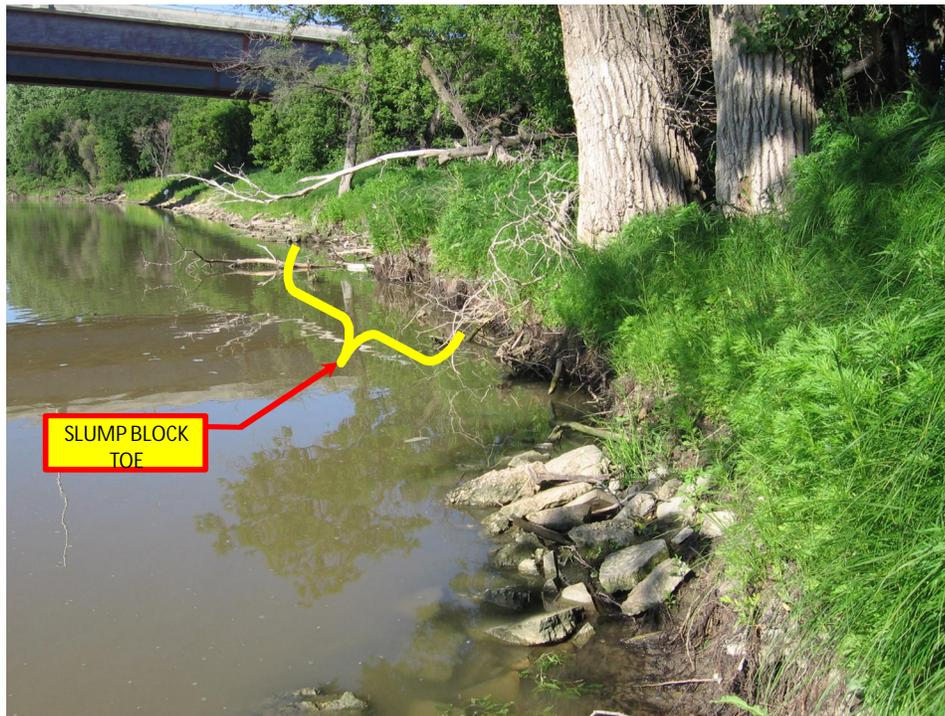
Toe erosion and toe of slump block upstream (south) of pipe crossing alignment. Photograph taken from pipe crossing.
